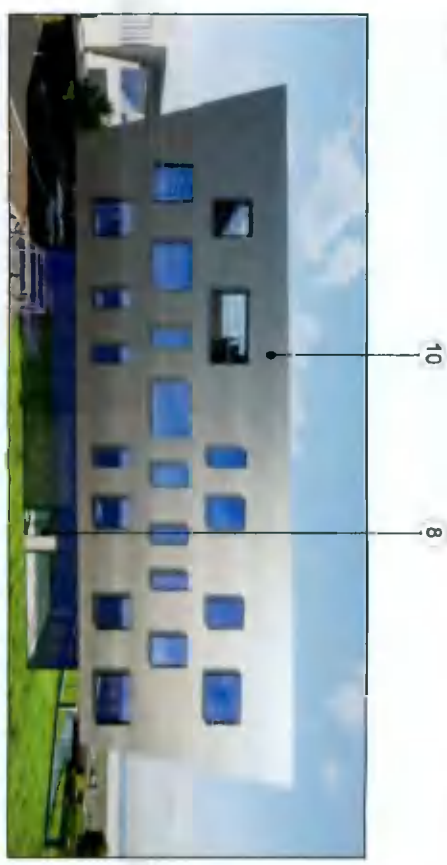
CENTRAL ADMINISTRATION BUILDING – WEST ELEVATION
